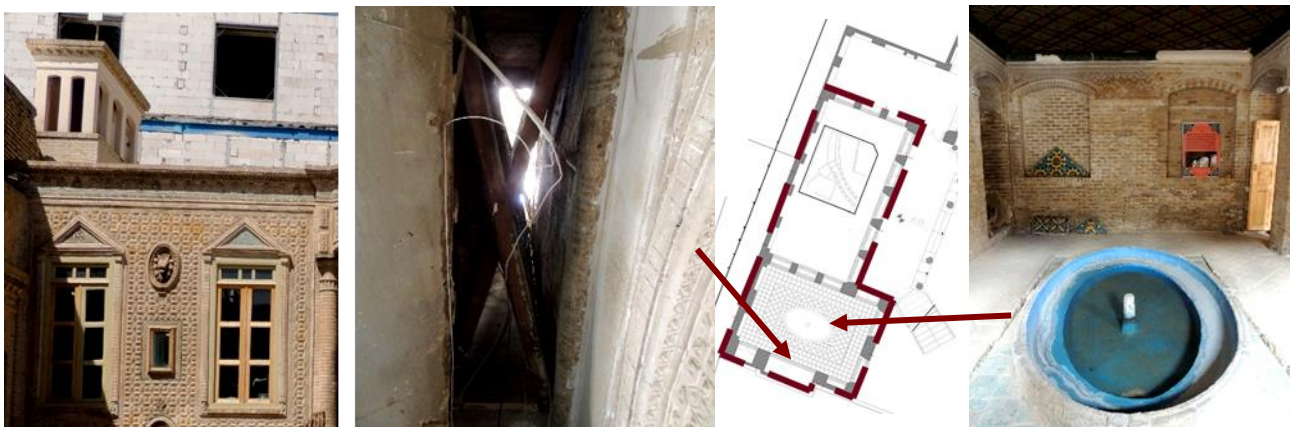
Application of traditional architecture structures as *badgir* and *hoz* in *hoz-khaneh*; summer living room, -1 floor.
